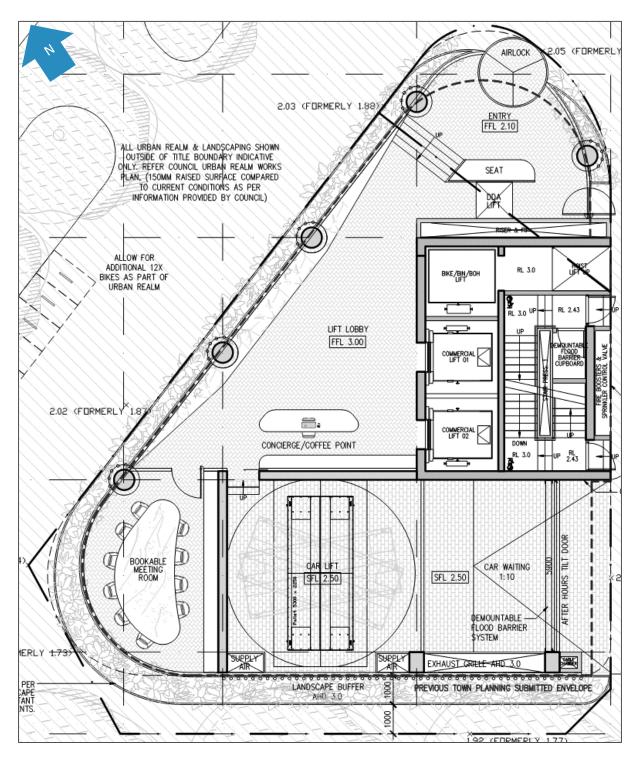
Proposed Site Plan (Image Source: Elenberg Fraser)
